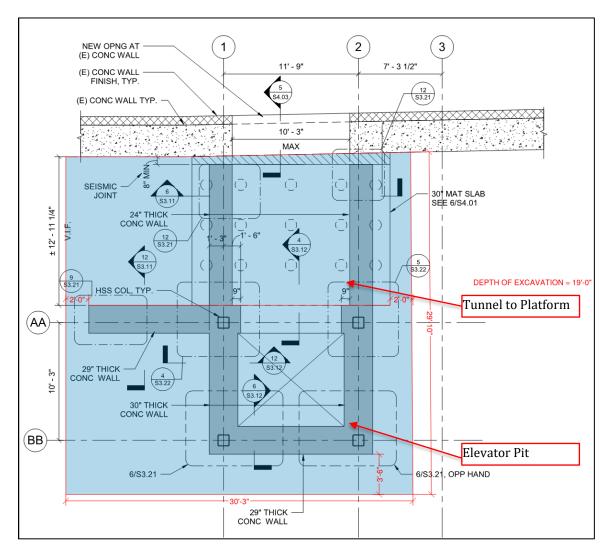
Elevator Pit and Tunnel to Platform Exavation Diagram
